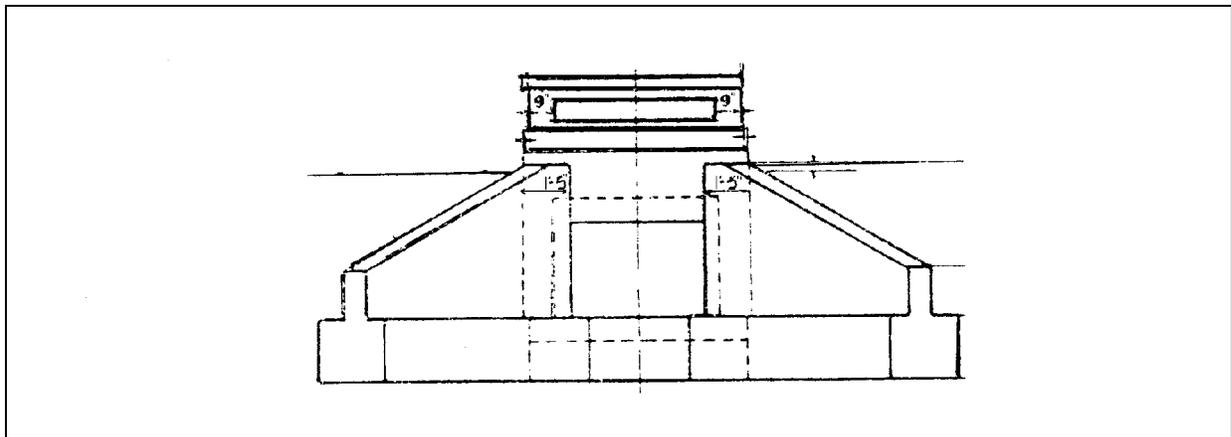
Box culvert from 1931 Standard Plans (Maryland State Roads Commission 1931). Note incised parapet.
